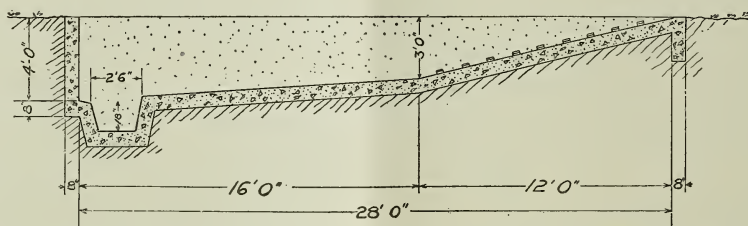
SECTIONAL DRAWING OF SHALLOW CONCRETE MANURE PIT.
